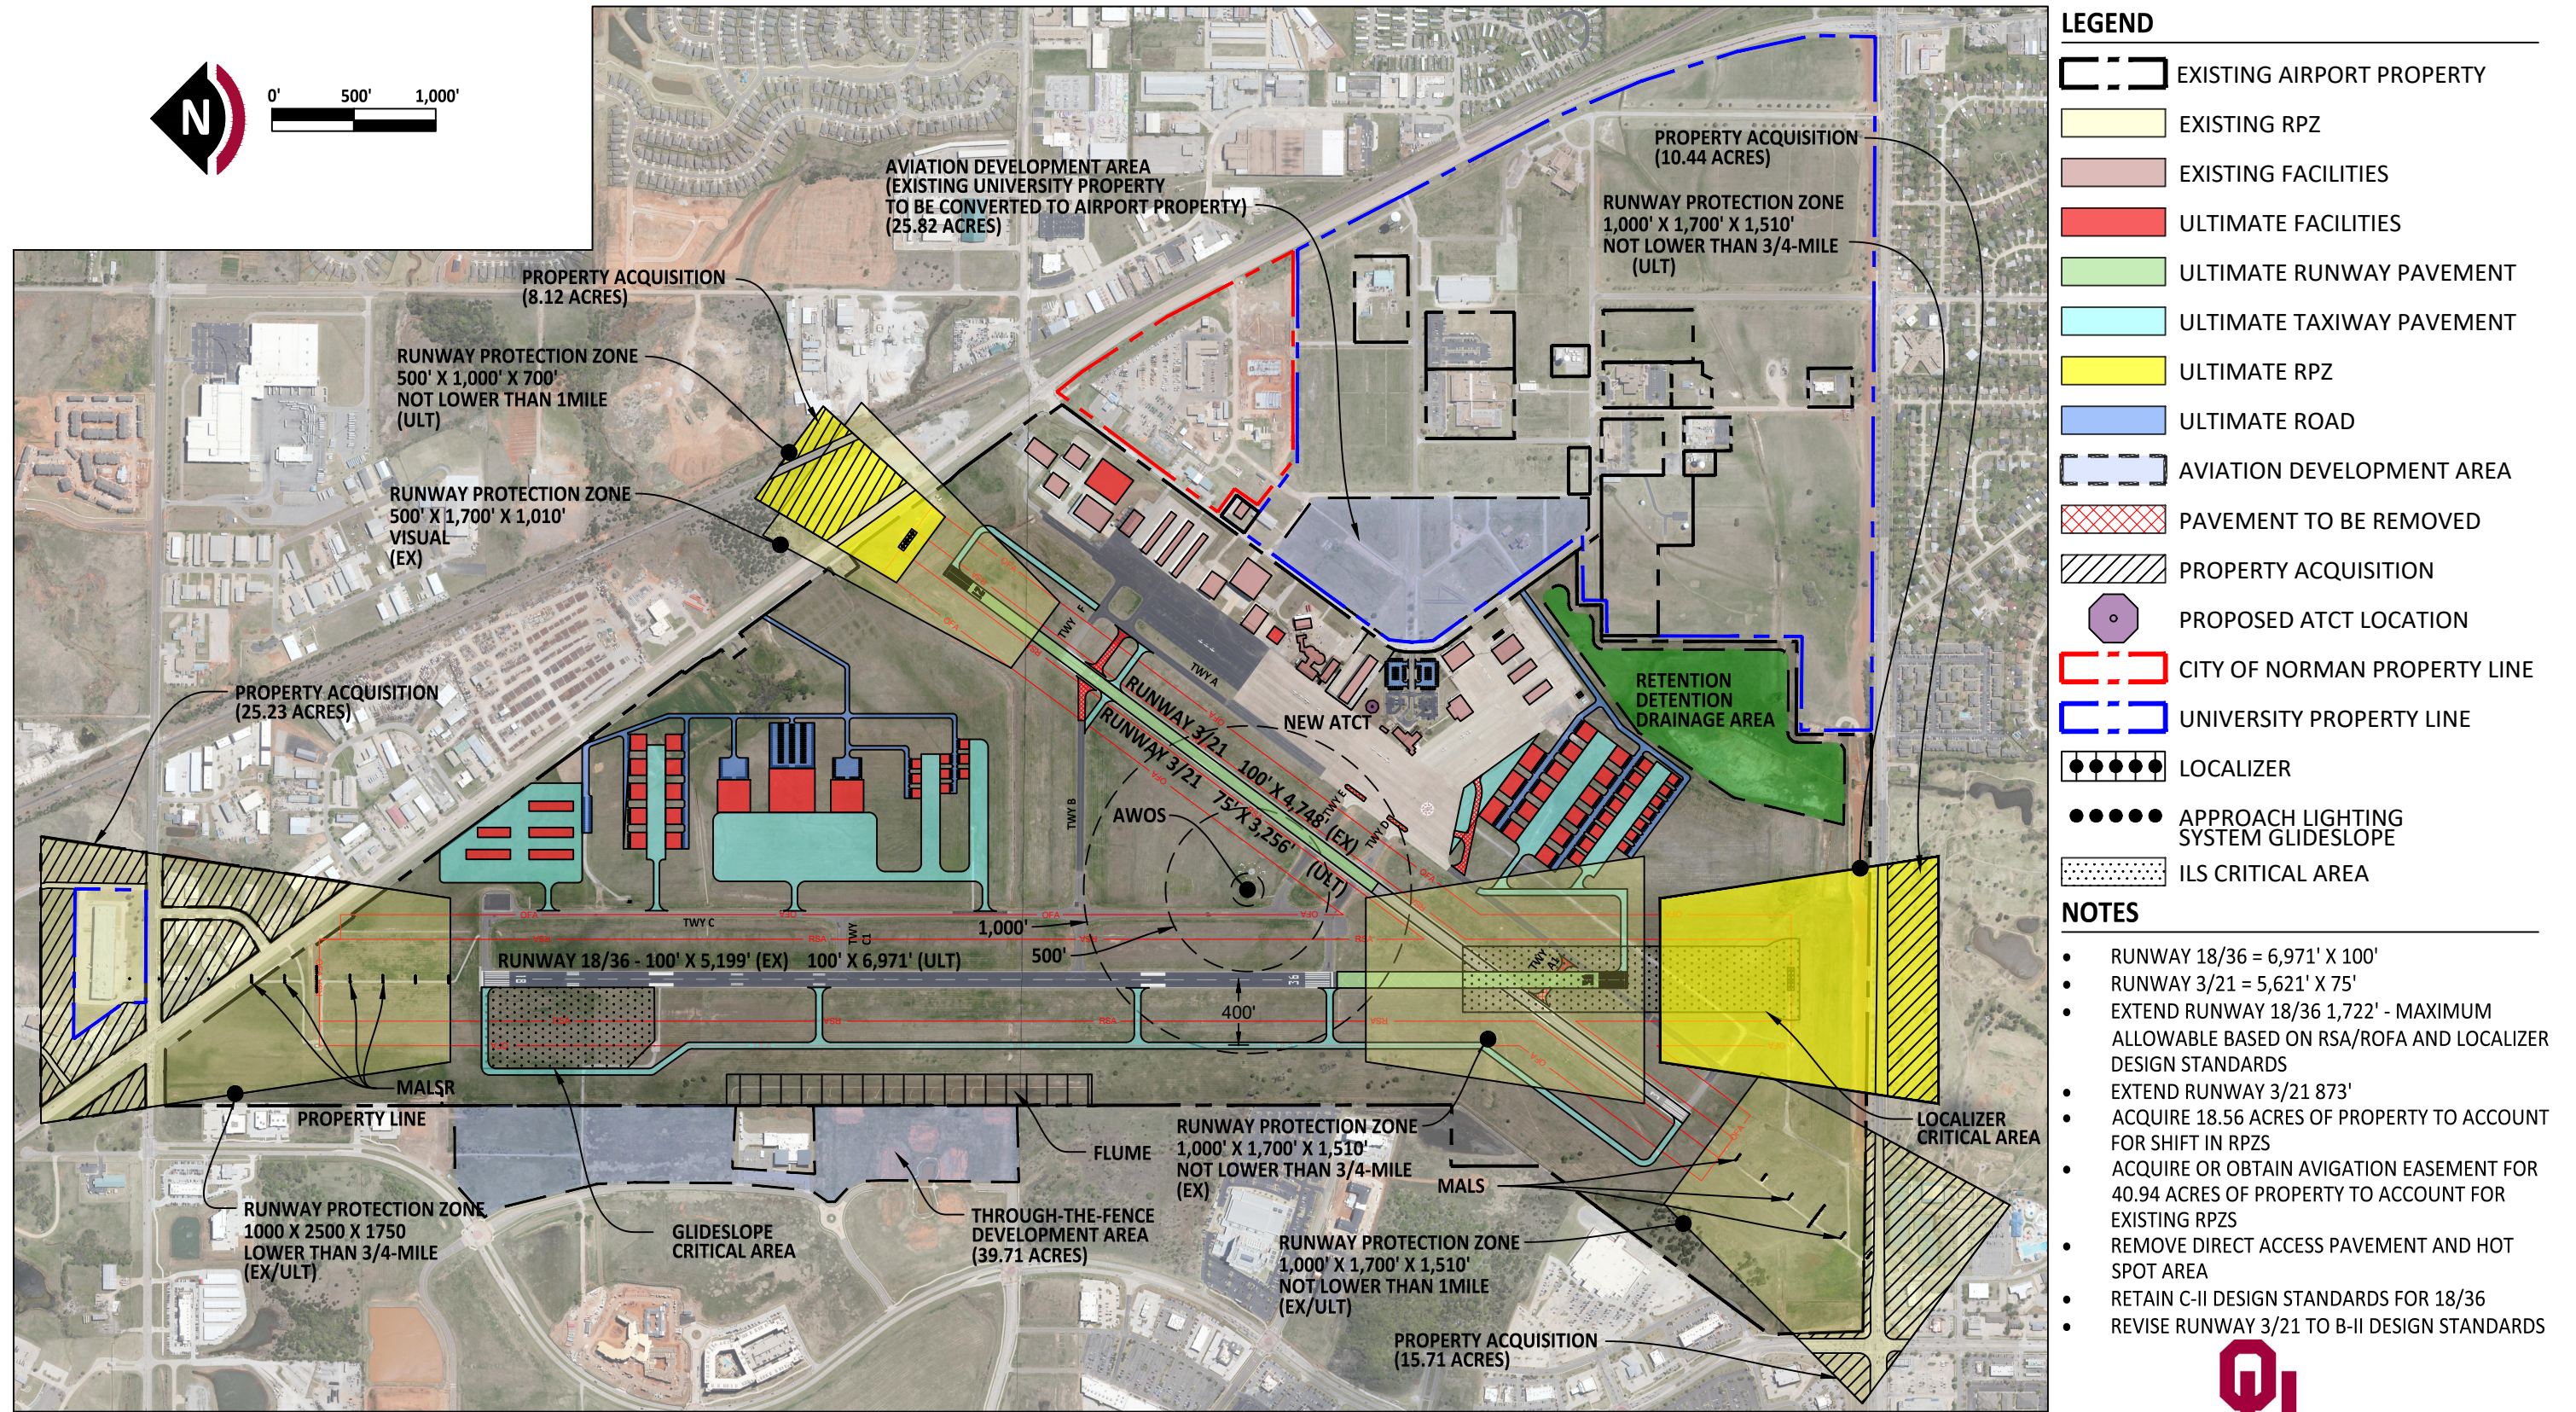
RECOMMENDED DEVELOPMENT PLAN
